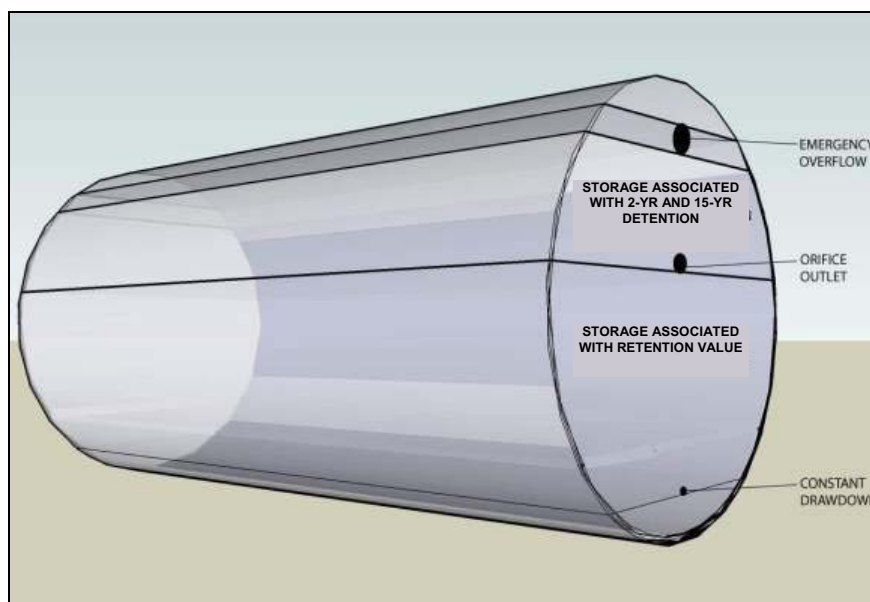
Tank Design 3: Constant drawdown, Storage Associated with Design Storm, Channel Protection and Flood Volume.
